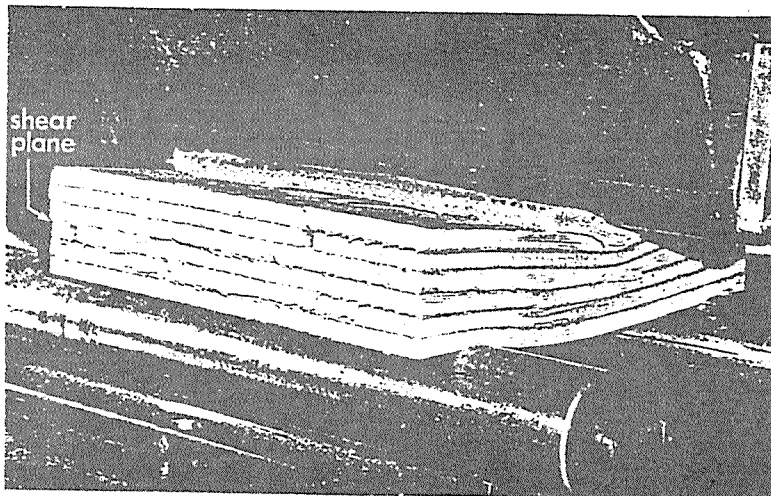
A 2- by 8-inch LVL plank specimen illustrating test setup and horizontal shear failure.
